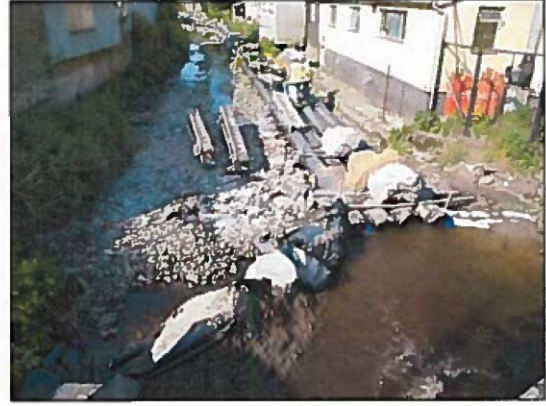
Damming and diverting of river by bridge in preparation for dredging. Looking south from bridge.
